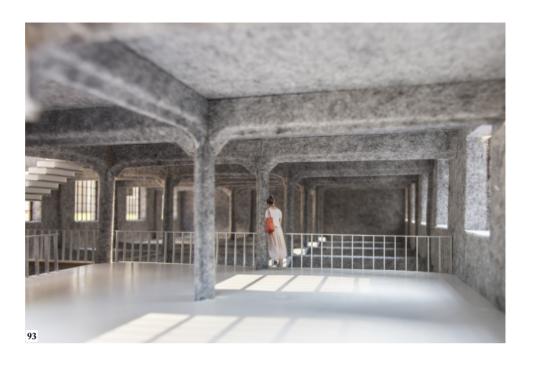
cladded exhibition room, floor 5 study model, scale 1:25
